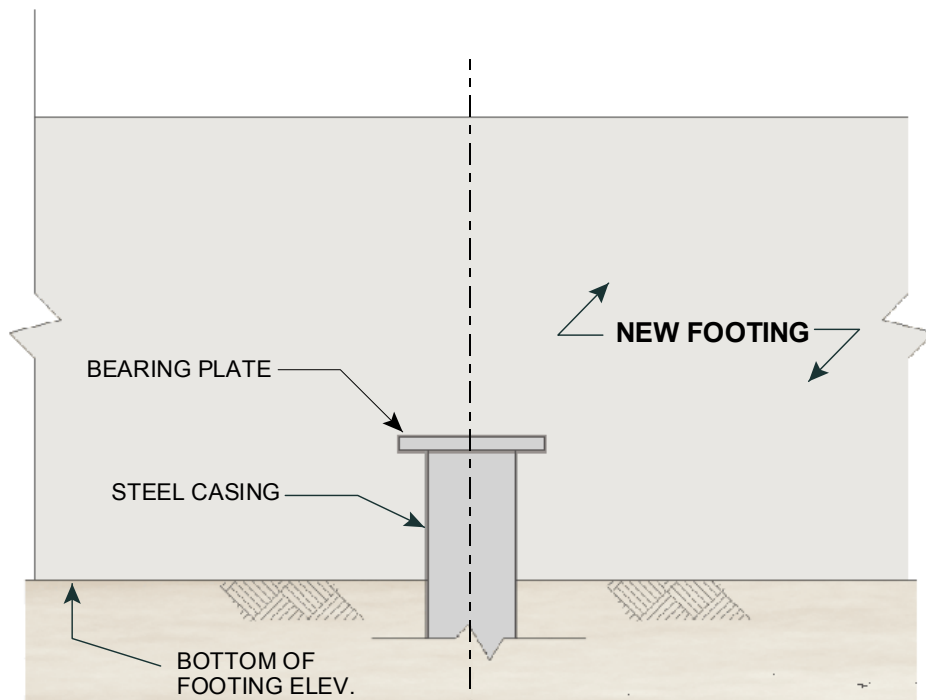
Pile to New Footing Connection Detail used for High Loads (compression loads).
